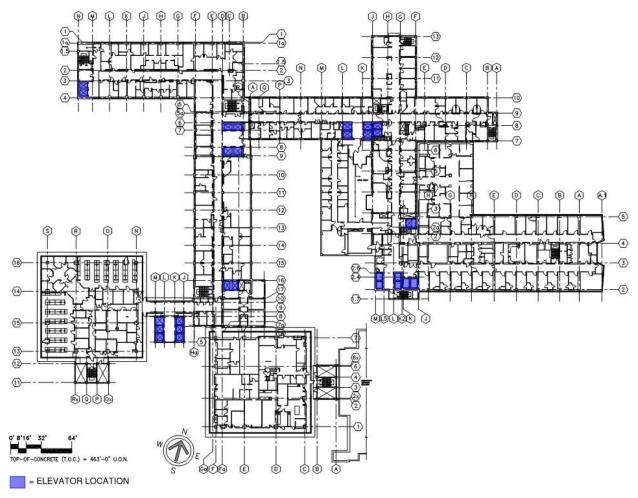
Typical floor plan showing the Health Sciences, Medical Sciences, Long Hospital, and Moffitt Hospital buildings. Common floor elevations connect the buildings. Elevator locations are shown highlighted.
